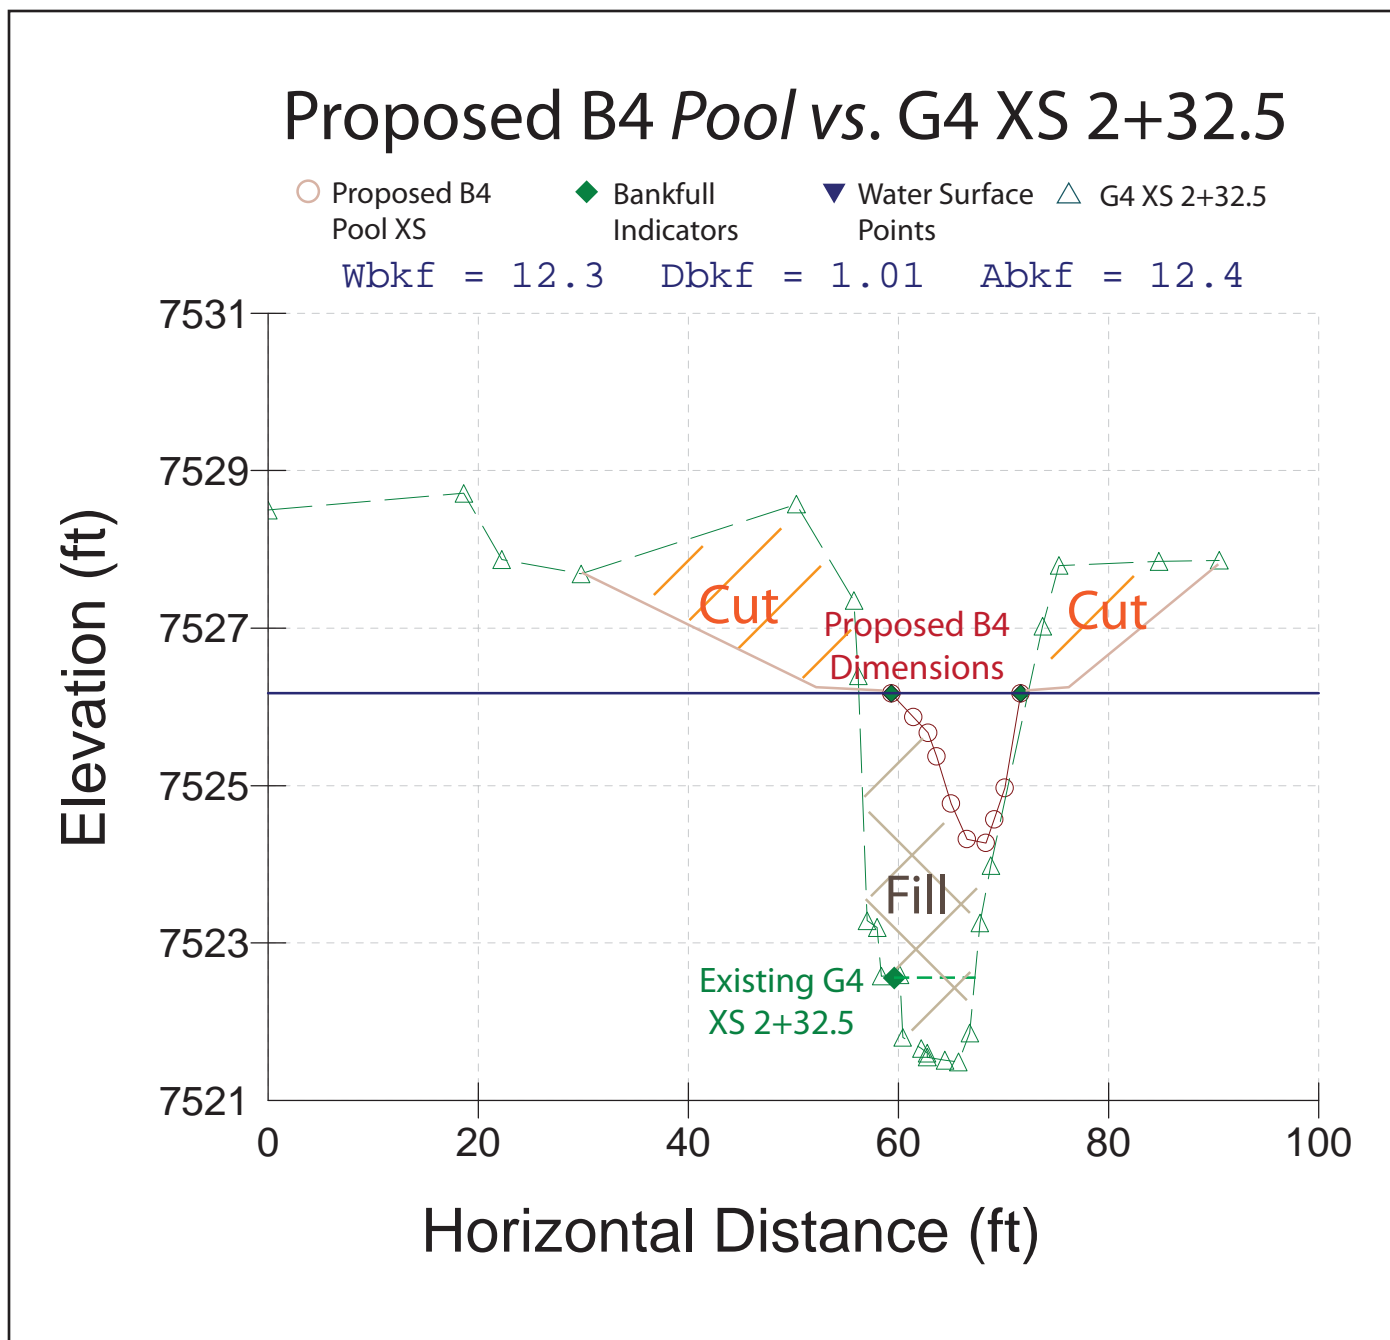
The proposed B4 *pool* cross-section compared to the existing G4 cross-section 2+32.5, indicating the cut and fill requirements and new bankfull elevation.
